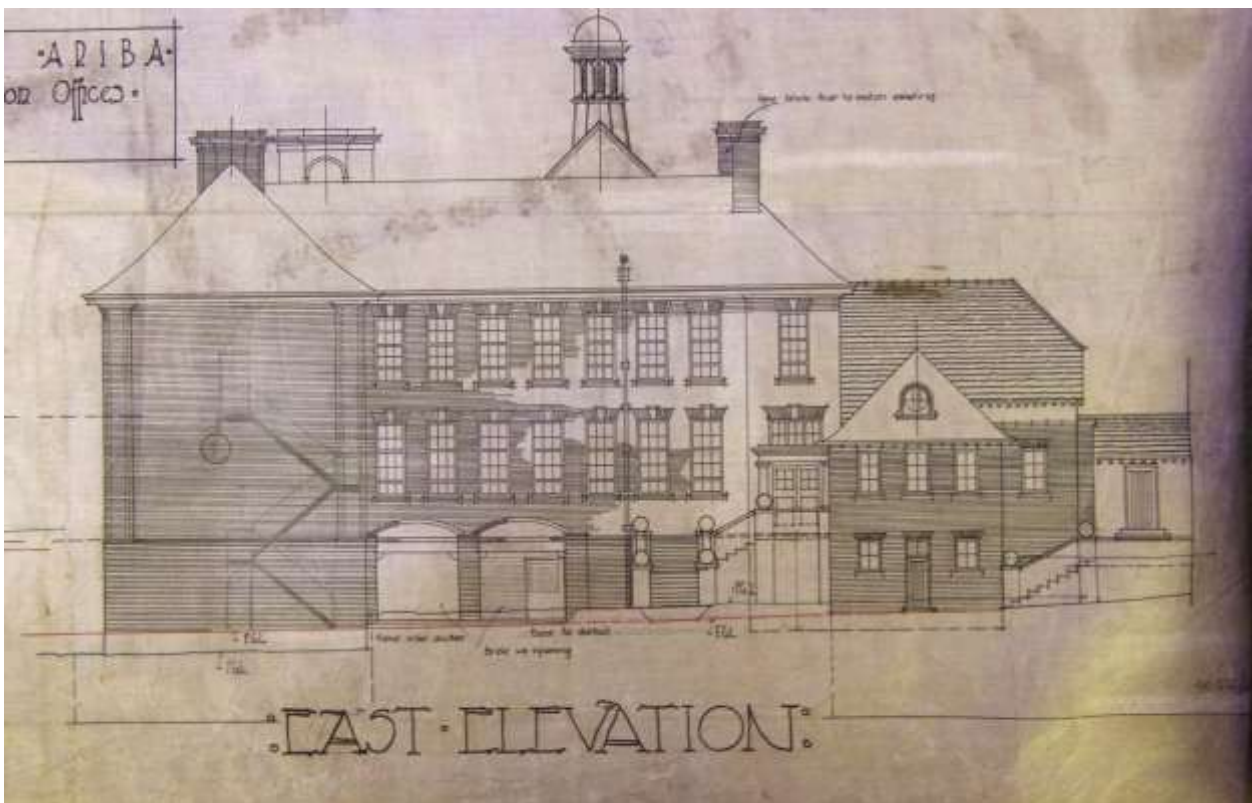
East elevation as built. (Note later pencil additions indicating the position for the 1960's fire escape)
